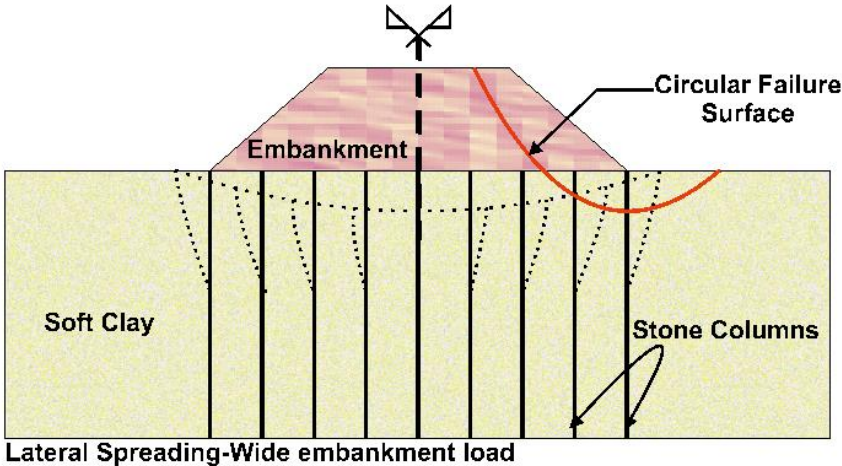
Failure styles of granular columns under embankment (Barksdale & Bachus, 1983).
